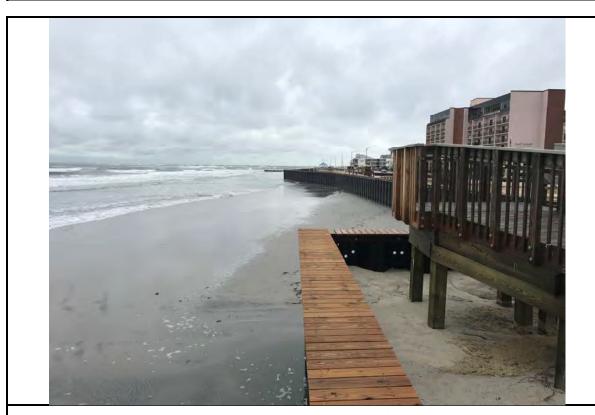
View of timber cap and steel bulkhead at 7th Avenue looking southwest.
